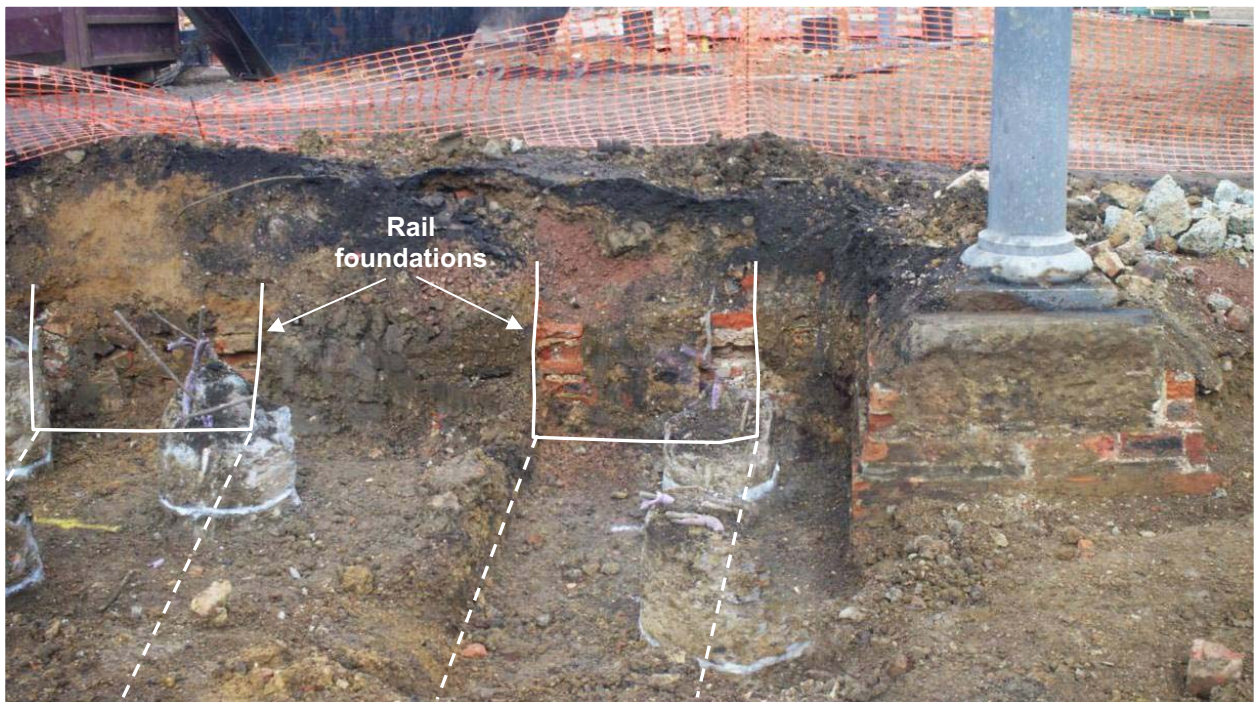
Deposits below floor of Triangular building, looking North. Showing rail foundations for parallel tracks and brick foundation for cast iron column.
